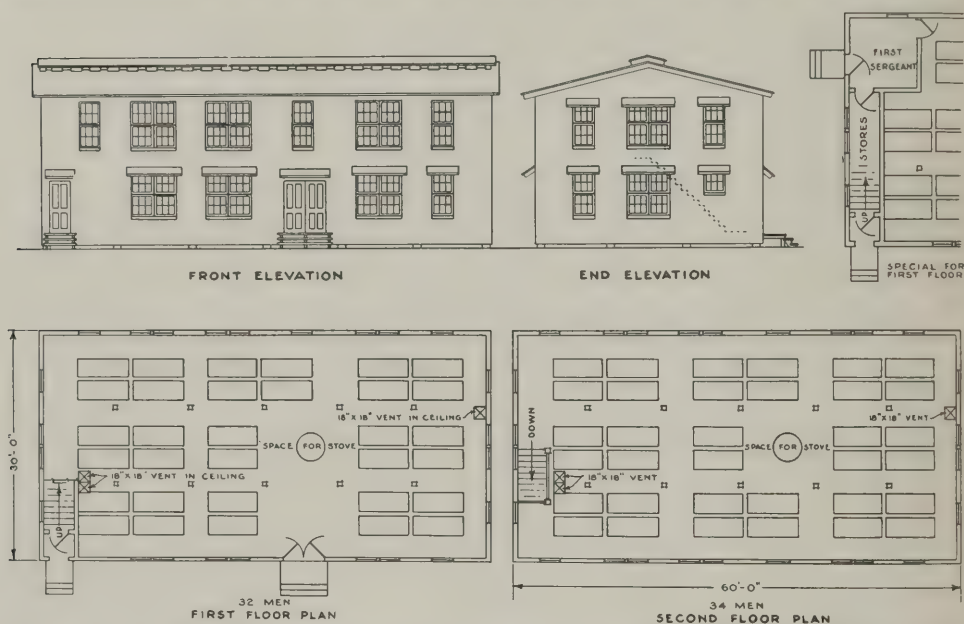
Standard two-story barrack, designed to accommodate 66 men, providing about 51 square feet of floor space and 482 cubic feet of air space per capita. All cantonment stations, except the 16 National Army cantonments, consisted of barracks of this type or of the type shown in Figure 13. Many of the National Army cantonments were expanded by constructing barracks of this design. There was no direct connection between upper and lower floors
